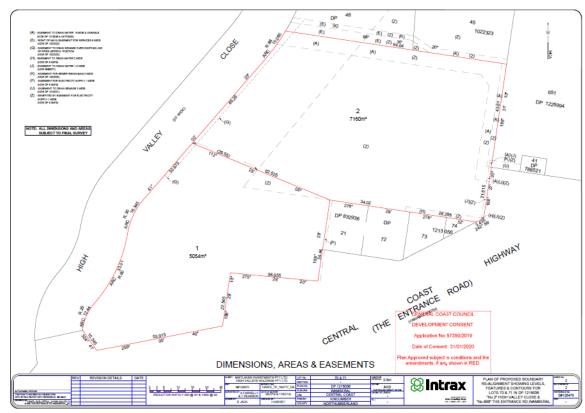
Subject site Proposed Lot 1 in subdivision approved under DA57350/2019
